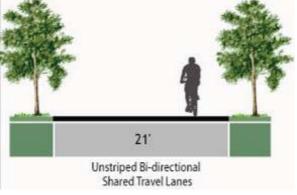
Option 1.9b Bicycle Boulevard on Sellwood Ferry Road
